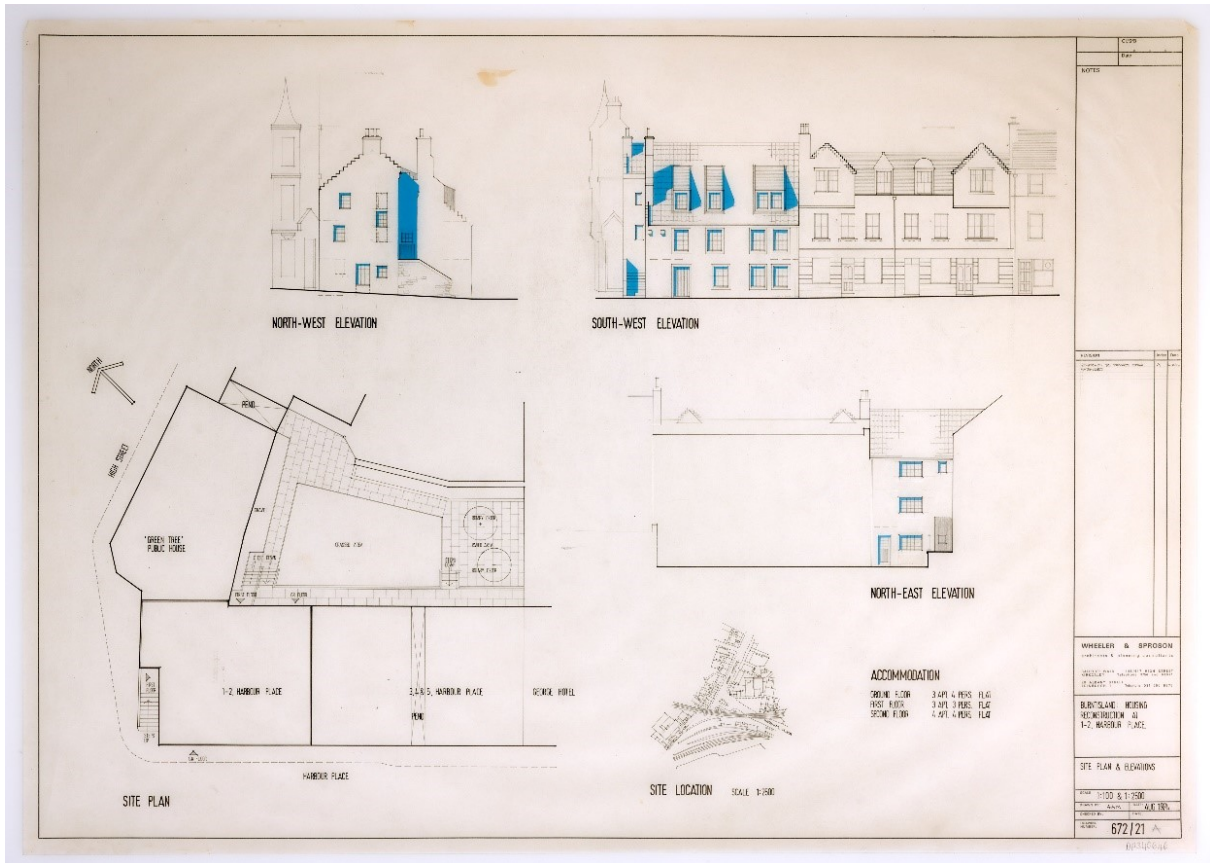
Site Plan and Elevations for 1-2 Harbour Place (Job 672) from August 1974.
